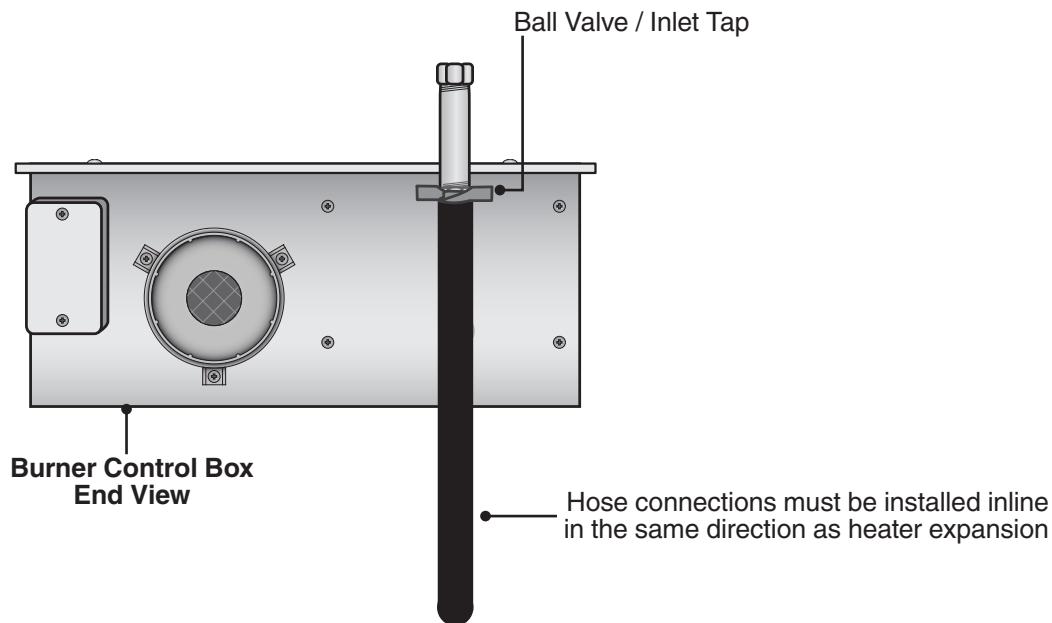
• Gas Connection (Flexible Gas Connection shown) • Side View
